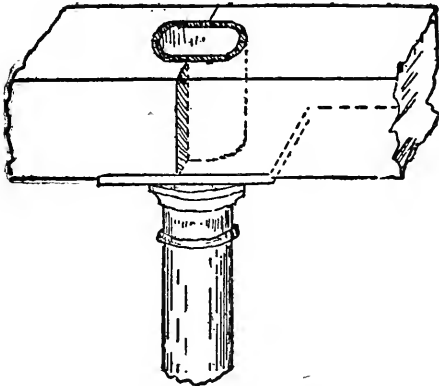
Framing of a Wooden Girder Around An Iron Column.
